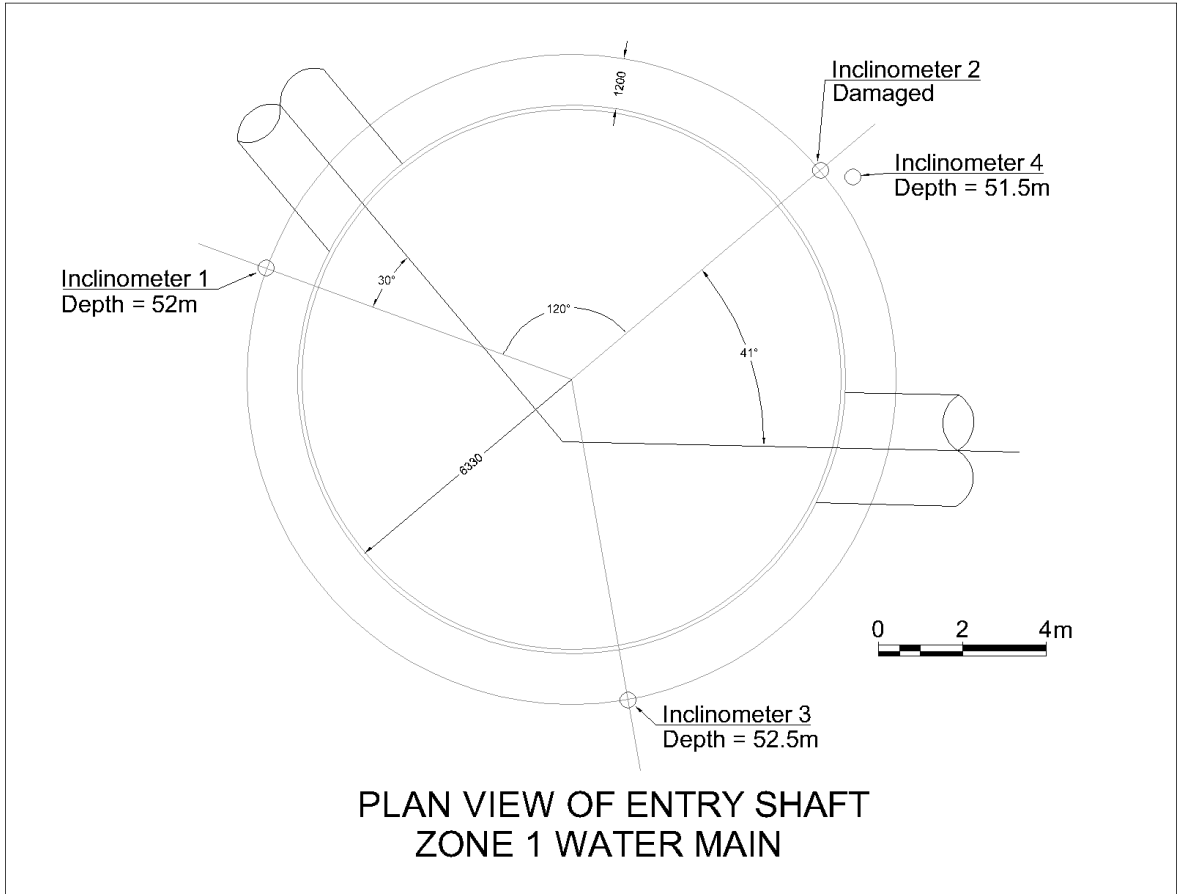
Plan view of shaft and inclinometer location (dimensions are in mm).
